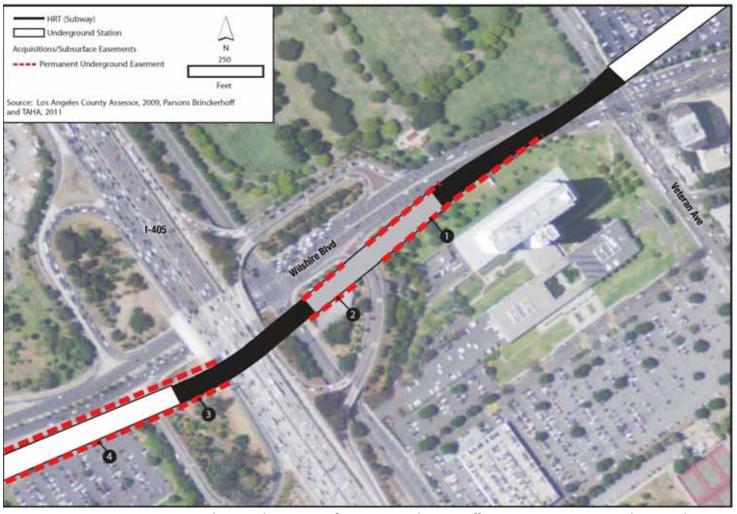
Permanent Underground Easements from Westwood/UCLA Off-Street Station to Westwood/VA South Station
